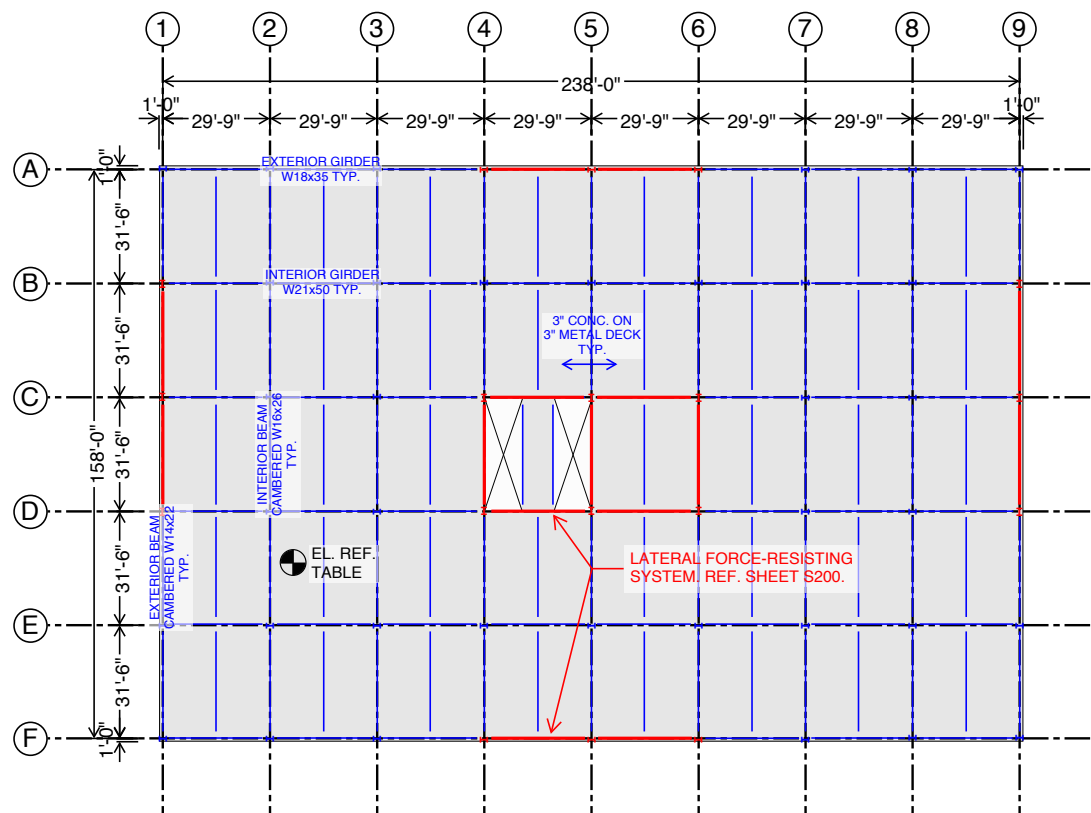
Typical upper floor plan for the large structural steel office building
